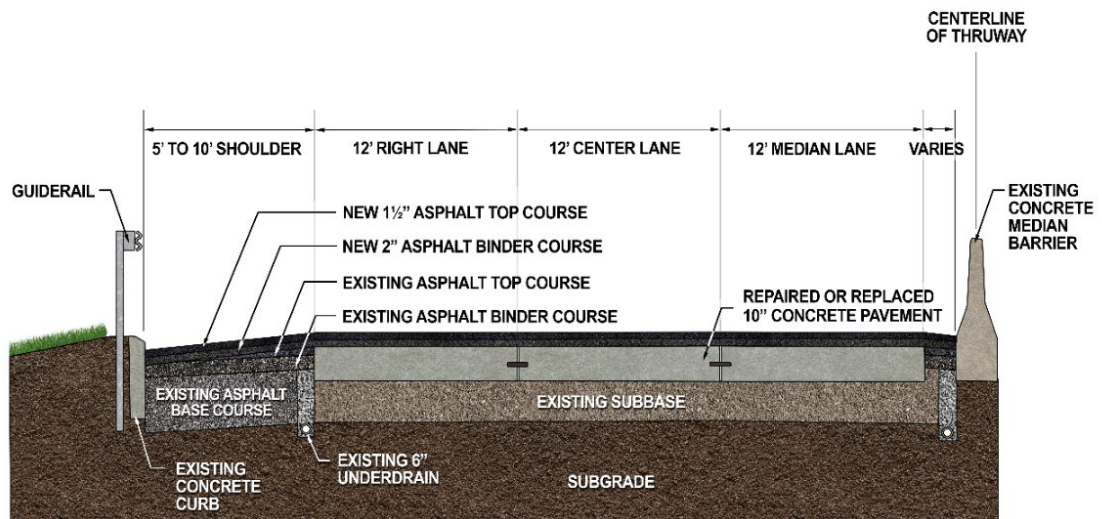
Illustrative cross section of repaired concrete with new asphalt overlay after construction
